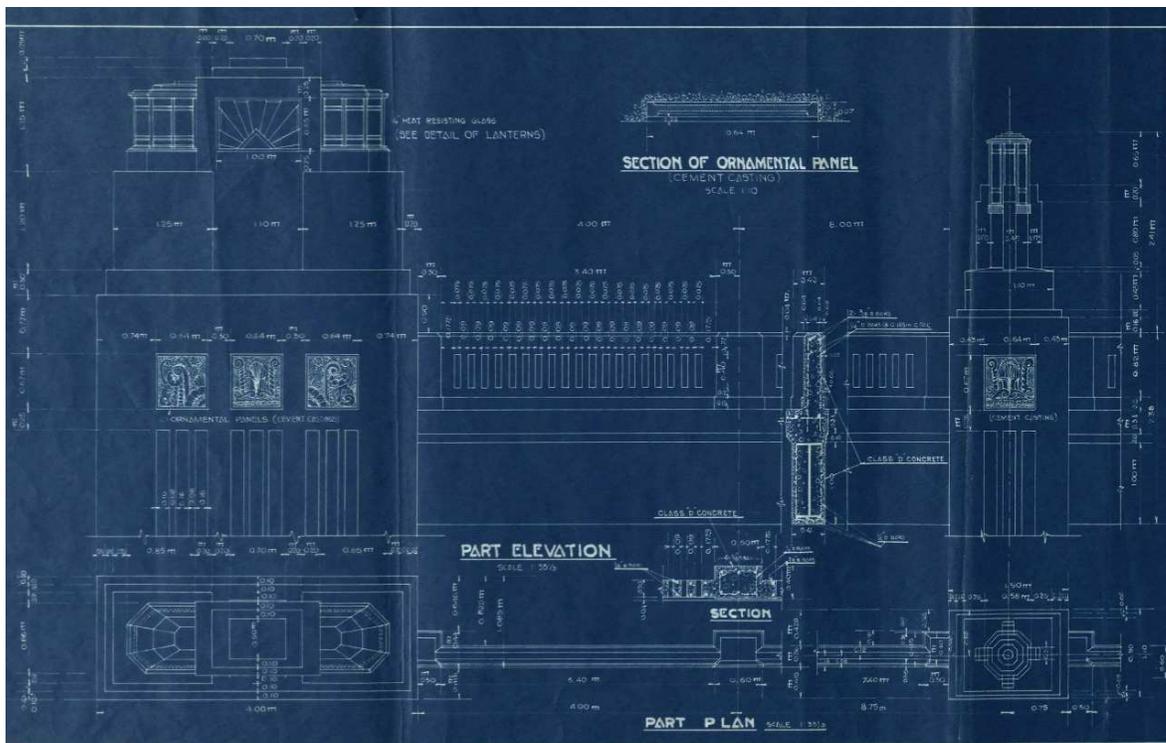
Detail of the pier, pillar and balustrades of Martín Peña Bridge. <sup>2</sup>
